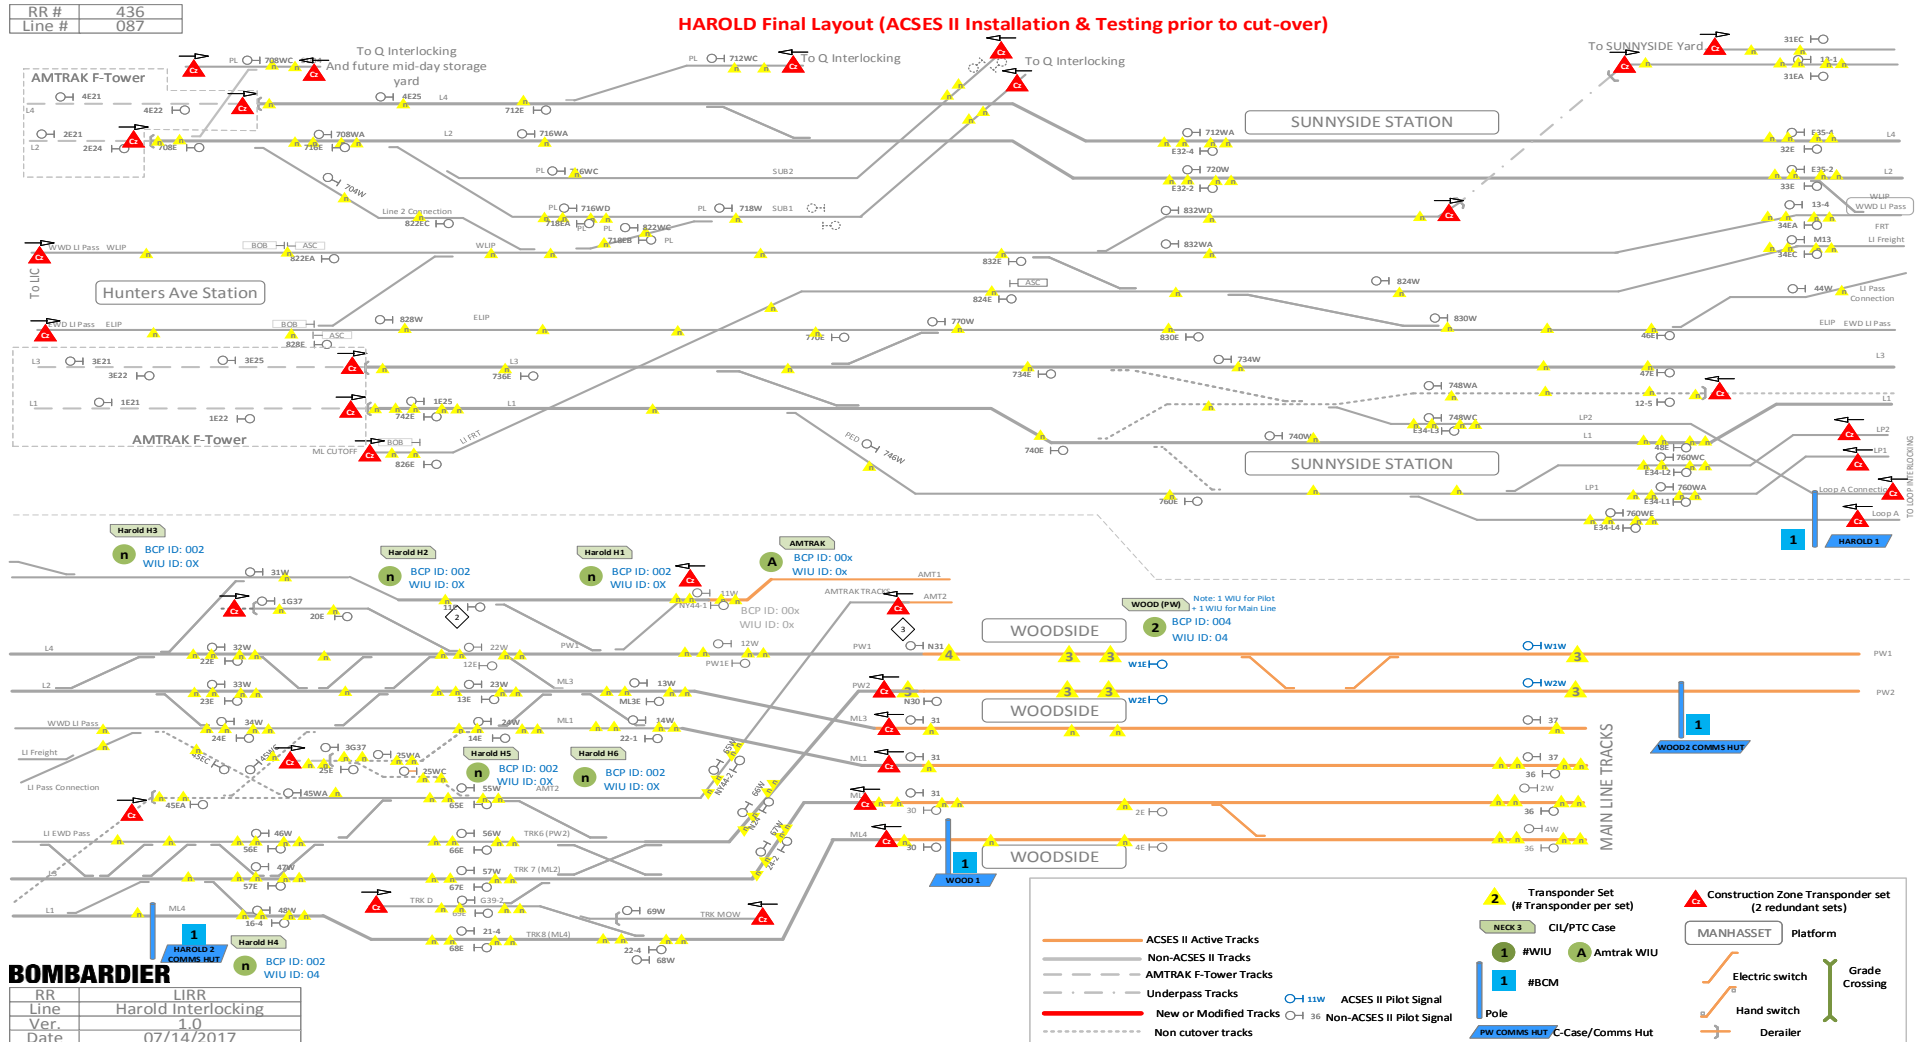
Harold Final Layout (ACSES II Installation & testing prior to cutover.
